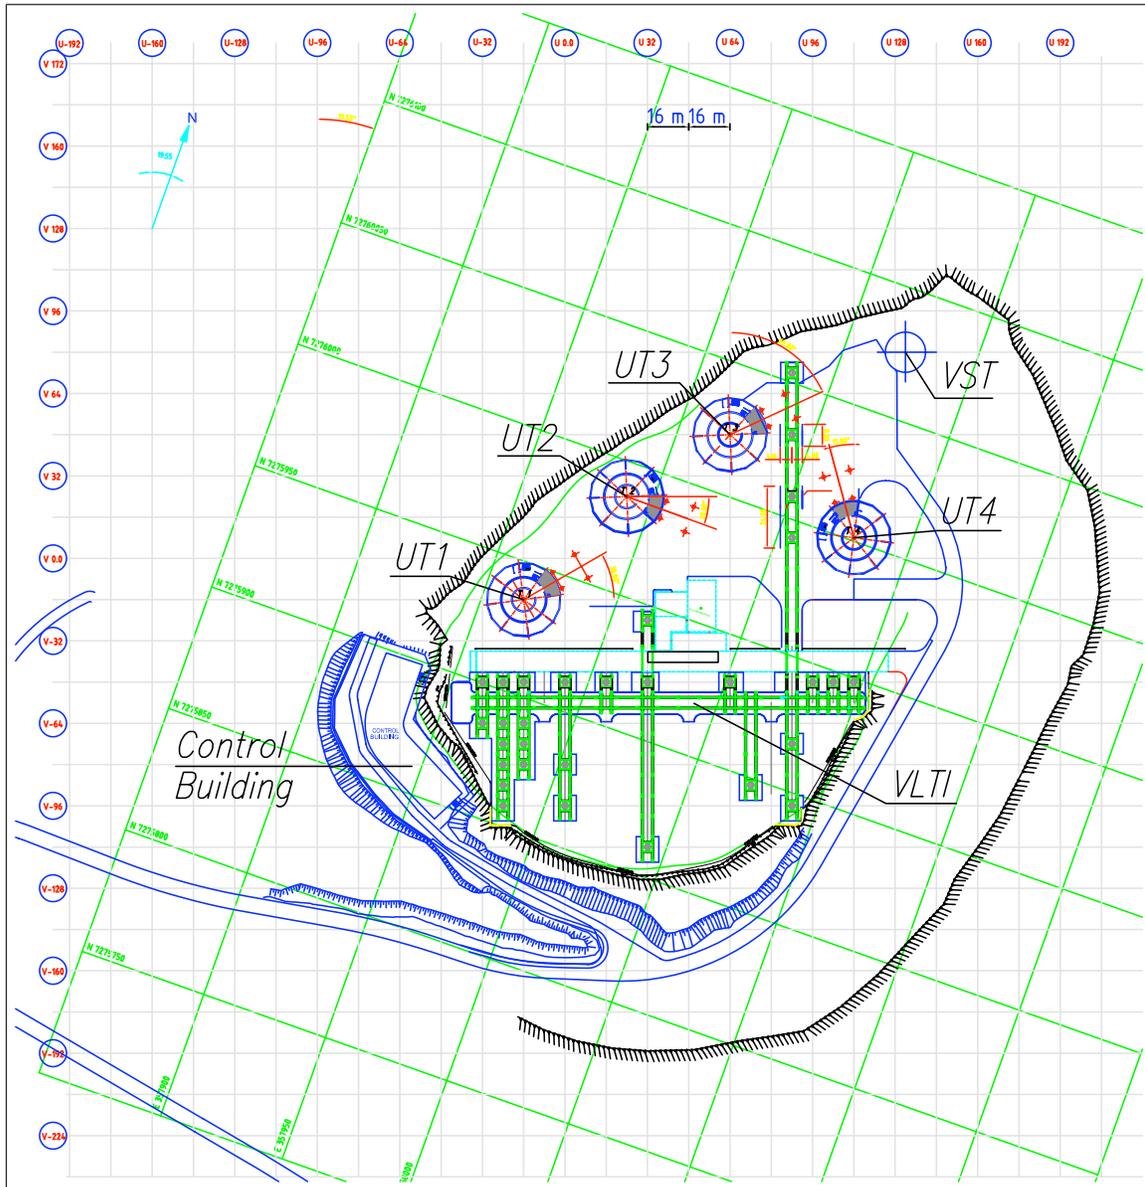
Plan of the Telescope Area of the Paranal Observatory
